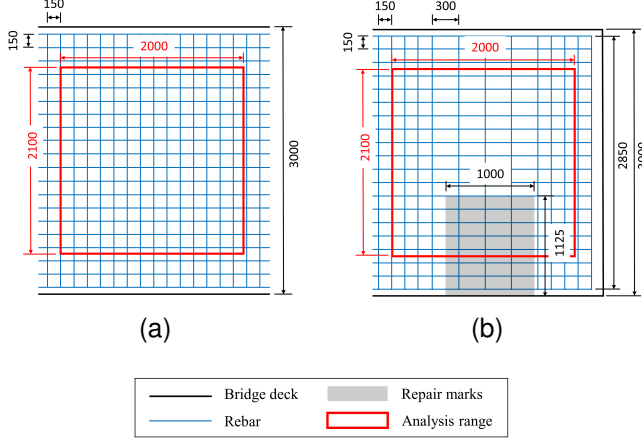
Rebar arrangements of the bridge deck specimens. (a) Specimen I: Both rebar spacings are 15 cm. (b) Specimen II: Main rebar spacing is at 15 cm and distribution rebar spacing is at 30 cm.
